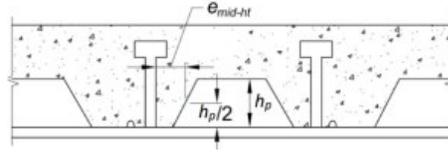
Cross Section of a Headed Stud Connection in Steel-Concrete Composite in AISC 360-16
